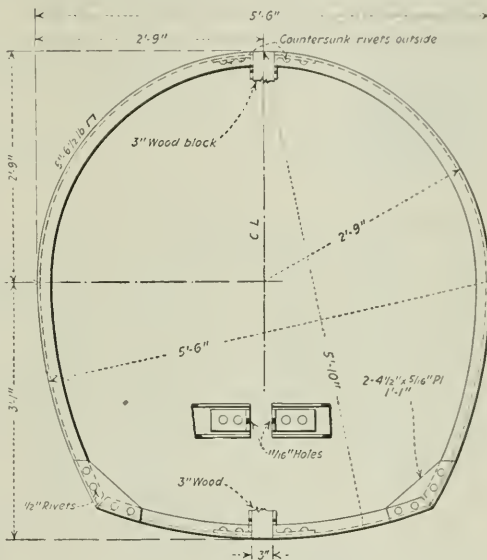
STEEL FORMS FOR SEWER TUNNEL
